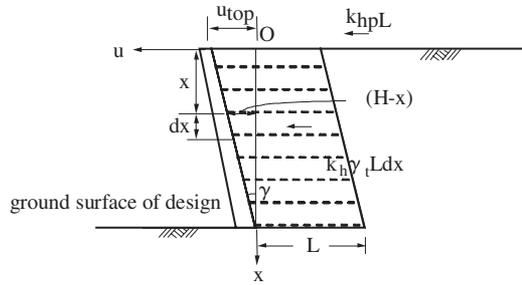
Modeling of GRS retaining wall for evaluation of shear deformation of reinforced backfill.
